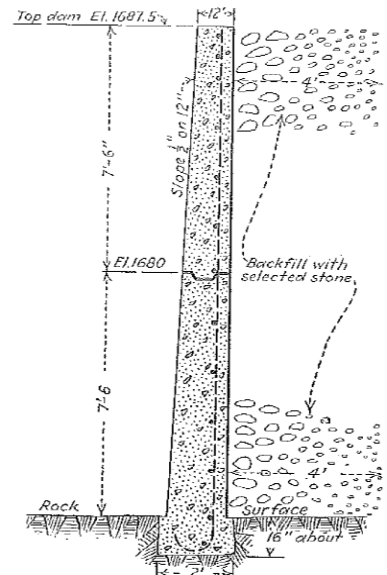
THE CUTOFF WALL was built in two sections, the first extending from rock to within 7½ ft. of the top. The top is level with the spillway of the existing dam in Dry River.
